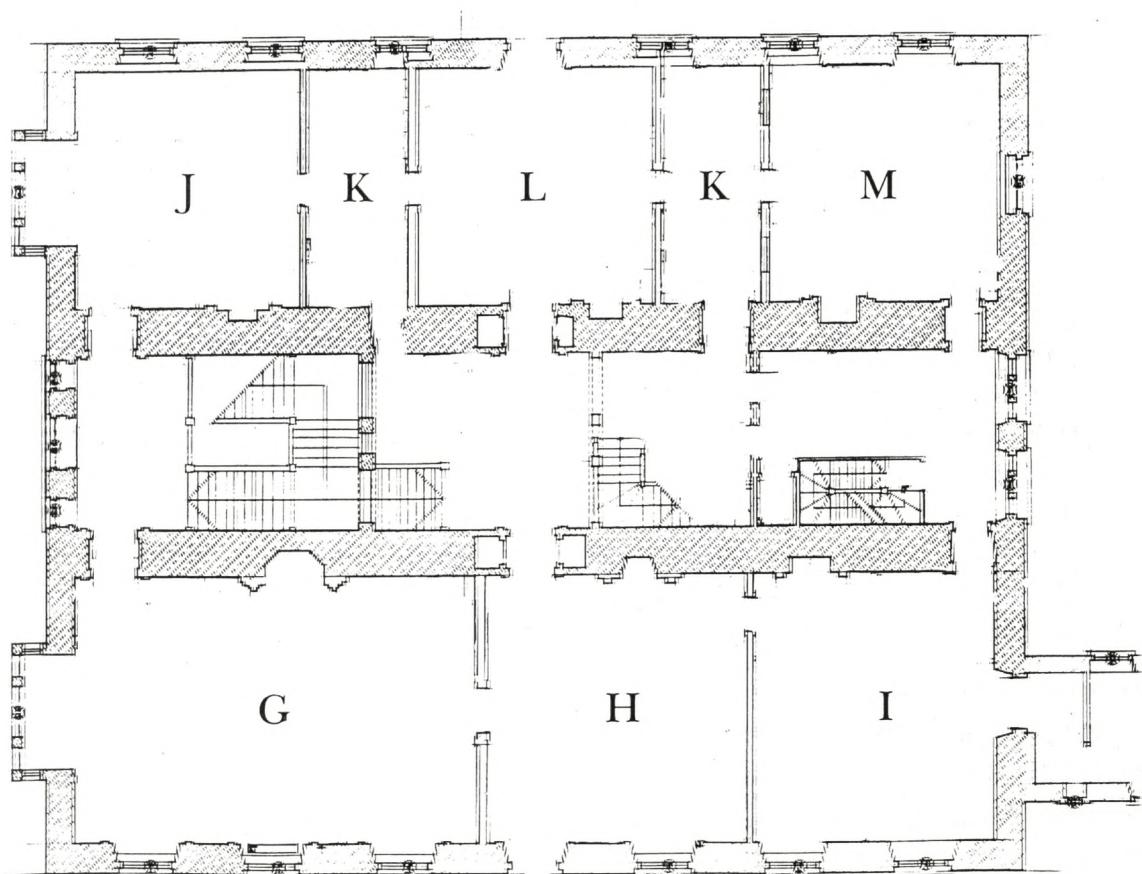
First-floor plan of Thorp Hall (Freeland Ress Roberts).
